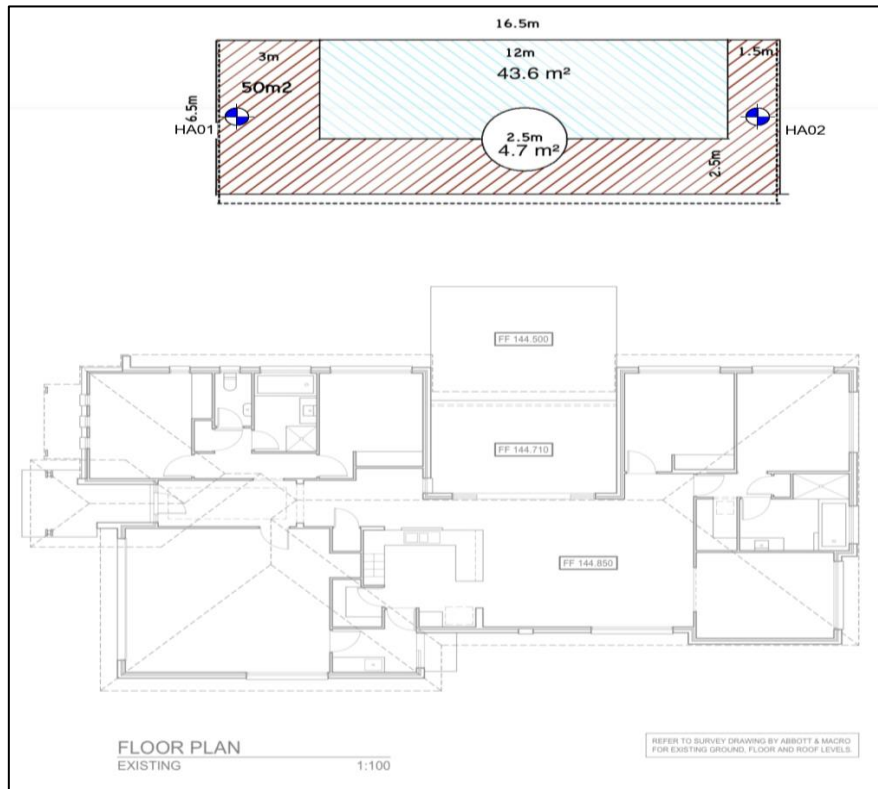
Site Plan with Hand Auger locations overlain. (Courtesy of Kate Barry)
